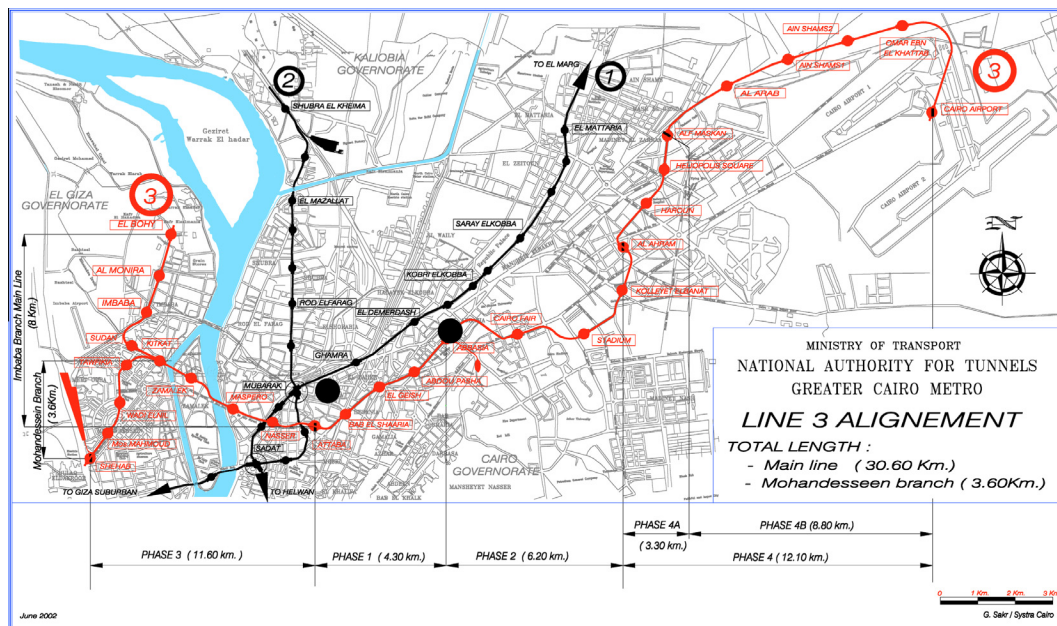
Plan of the Greater Cairo metro (Line 3) (after NAT, 2009).
